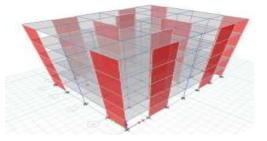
D Modeling of Building with 1.5% shear wall ratio
